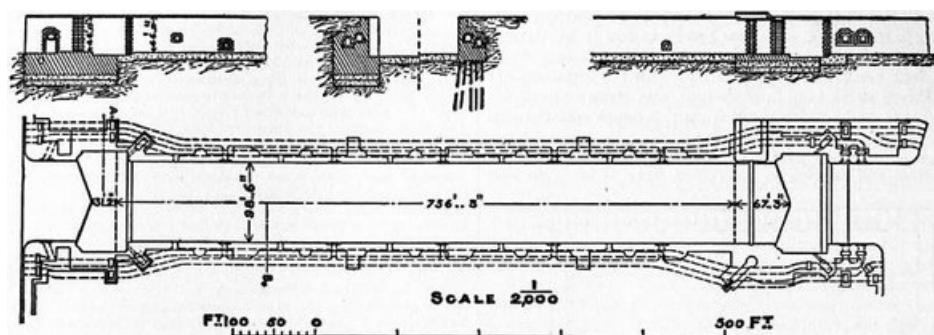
Florida Lock, Havre Docks, Sections and Plan.
